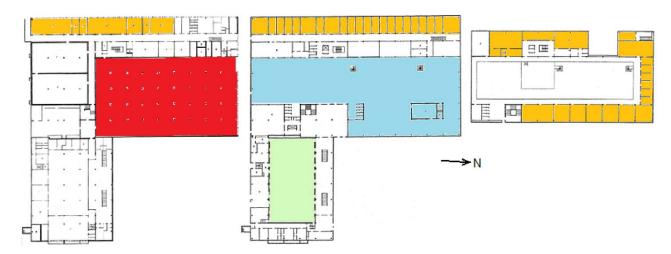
Location of offices at Hvidovre Community Centre, marked in yellow. Floor plan – basement (left), floor plan - ground floor (Middle) and floor plan 1st floor (right).
